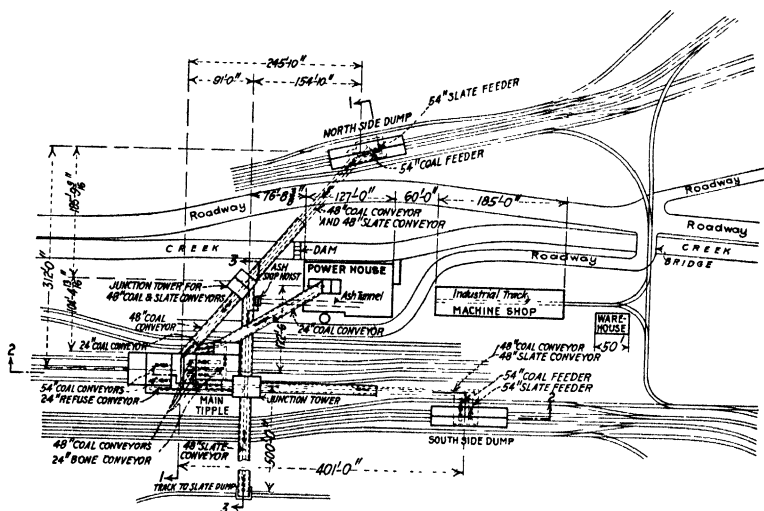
GENERAL ARRANGEMENT OF PLANT.
